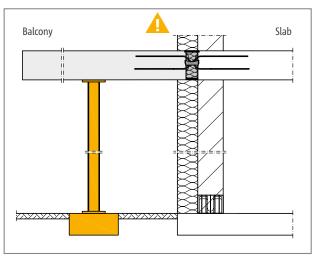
Schöck Isokorb® T type Q-E-VV, Q-E-W-VV: Support required at all
